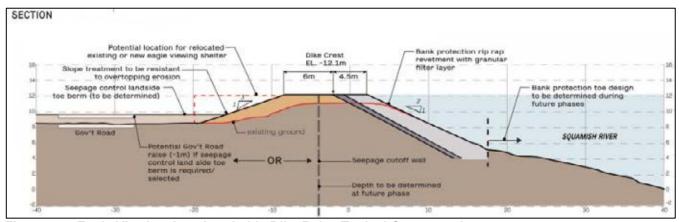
Eagle Viewing Area Land-side Dike Raise Typical Cross-section
